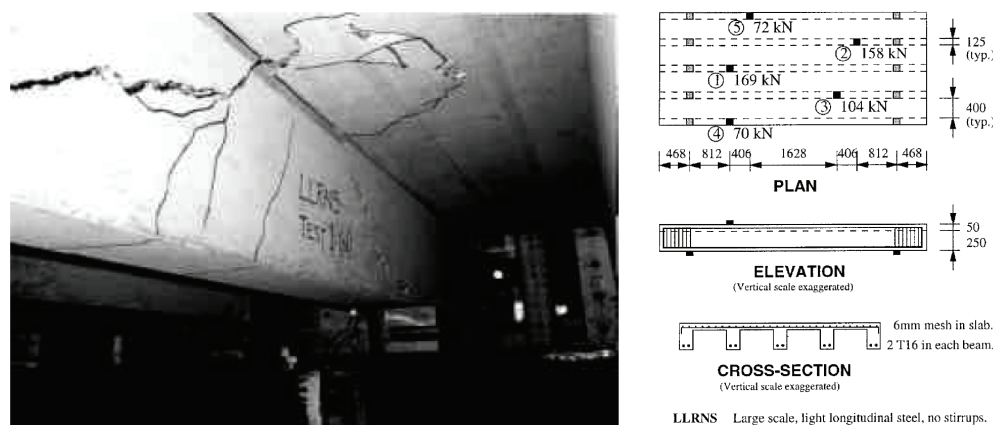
Shear failure of full scale beam-and-slab bridge (first test, LLRNS slab, adapted from (Ibell et al. 1999) [mm]
